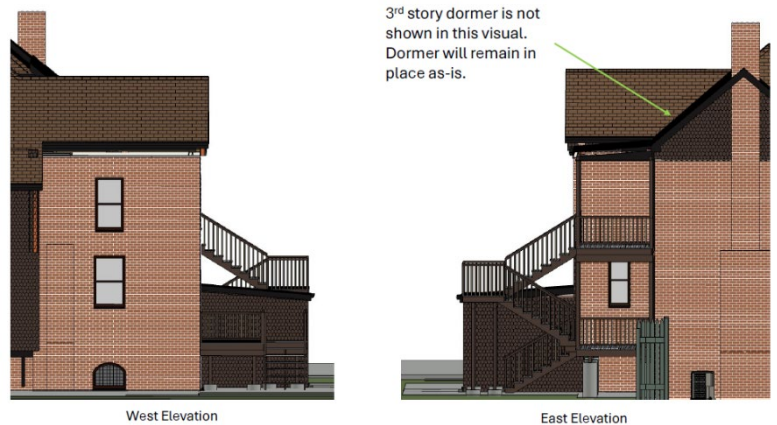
, by Applicant, July 2024: (South) rear elevation side views, showing proposed balcony and stair footprints. Note that the missing 3rd story dormer is drawing error confirmed by the applicant.
